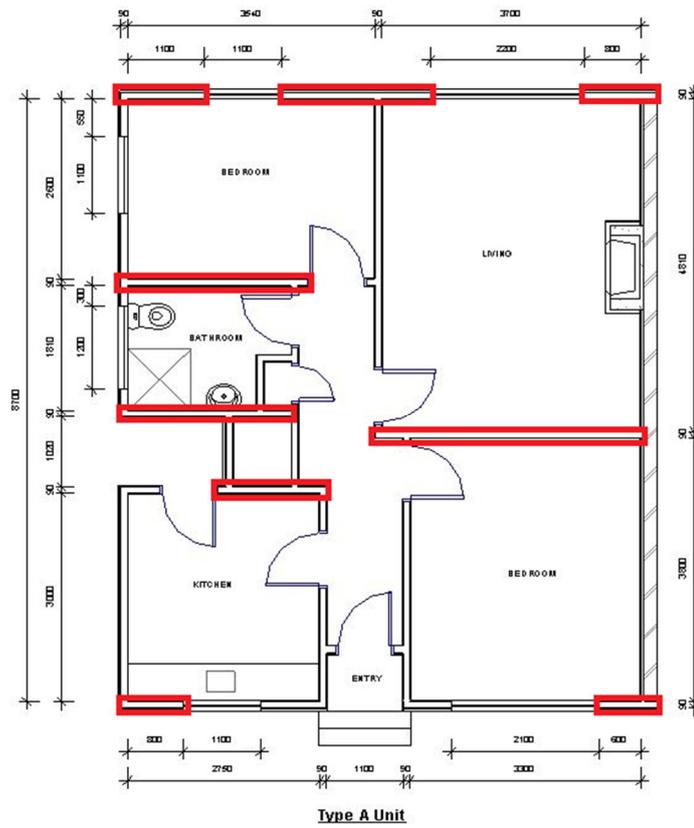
Walls used for bracing in the longitudinal direction Type A.
